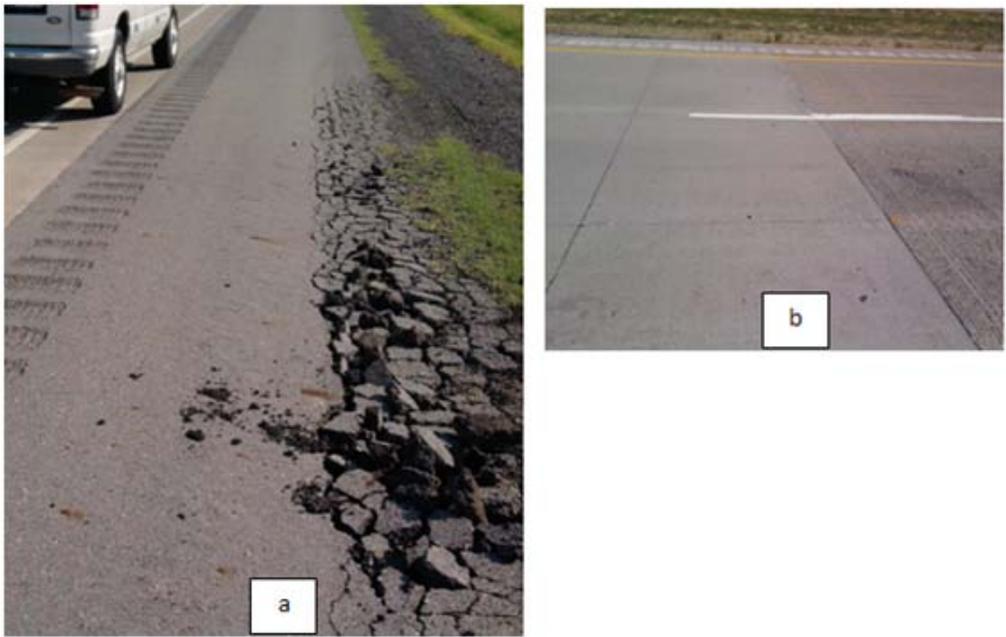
Photo a shows the deterioration of the asphalt shoulders. Photo b shows the interface of the overlay with a CRCP pavement. The end of the overlay was in excellent condition.
